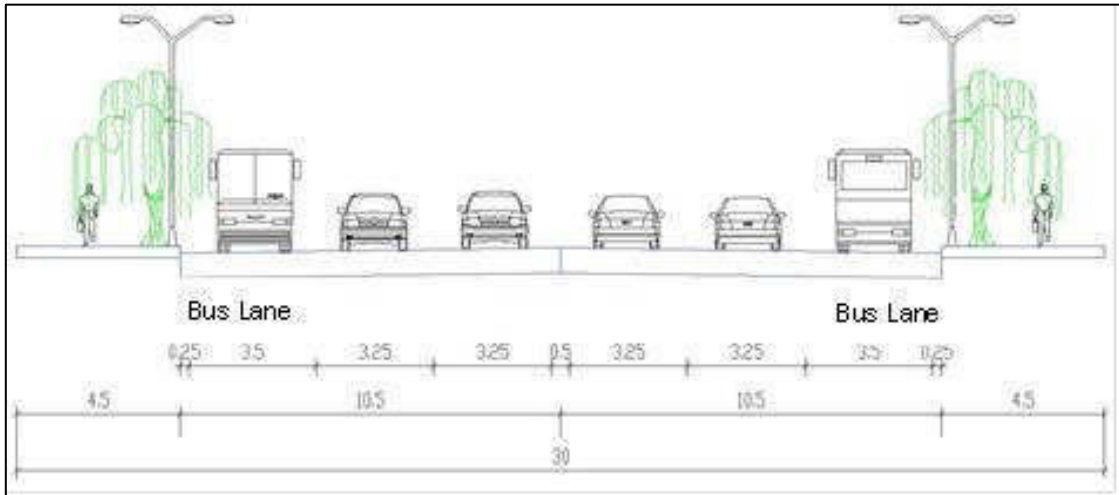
Cross-section of proposed 30 m wide road (HG)
